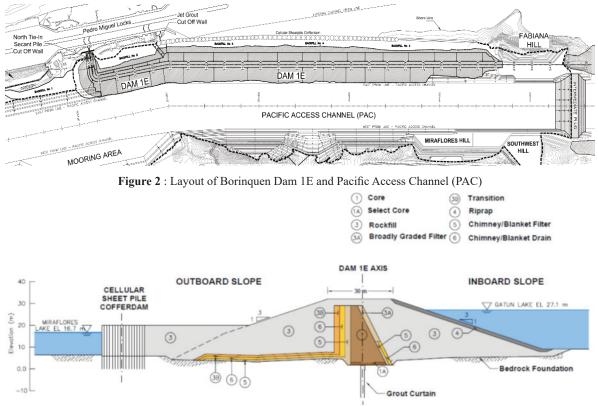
Typical Cross Section of Borinquen Dam 1E
